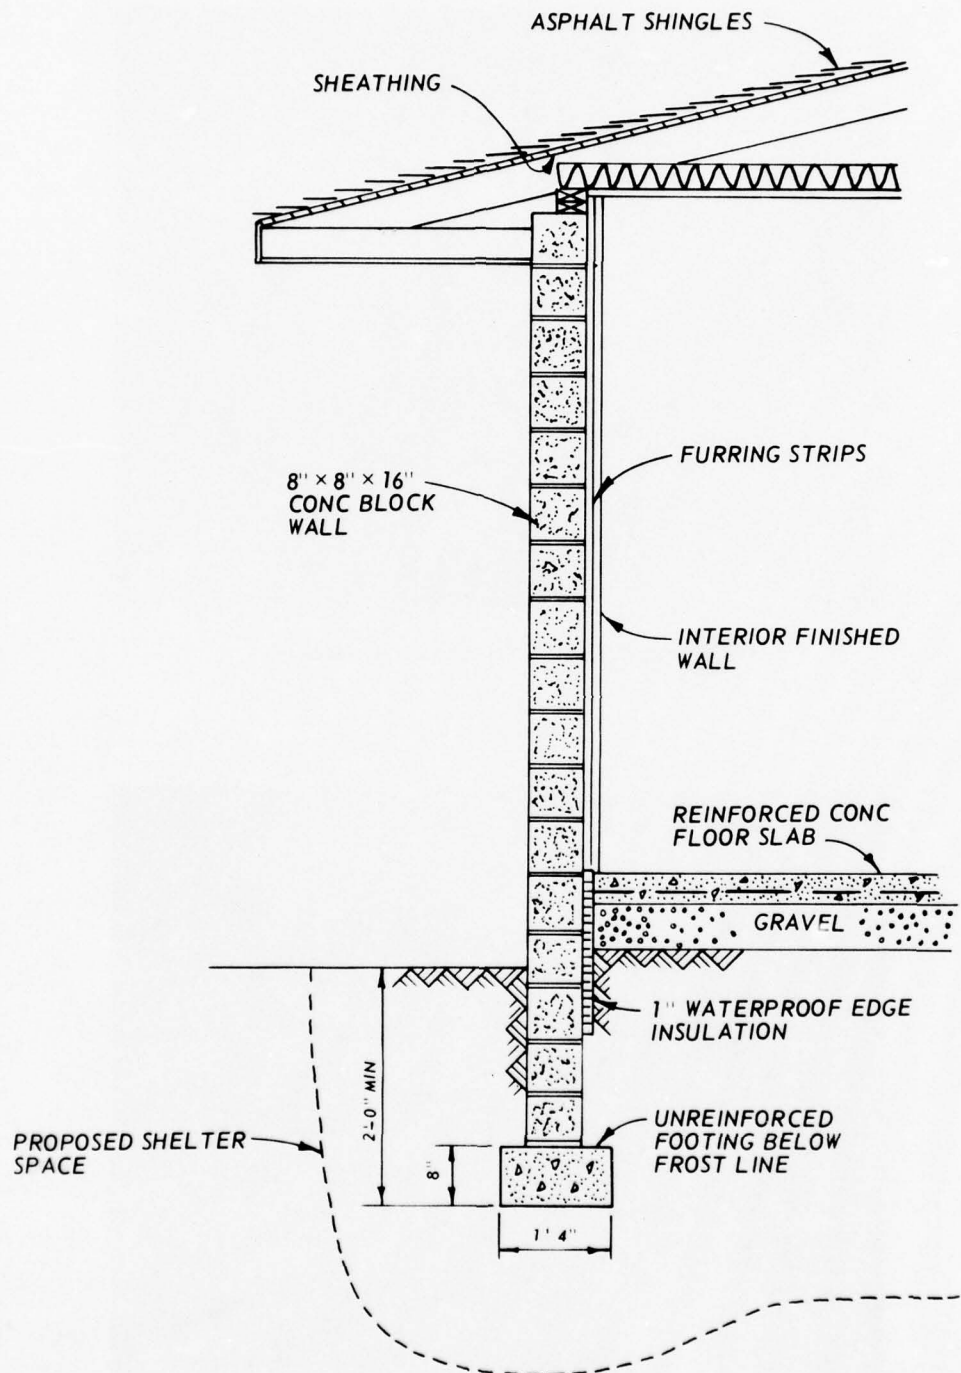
Cross section of a house having an unreinforced perimeter footing.
